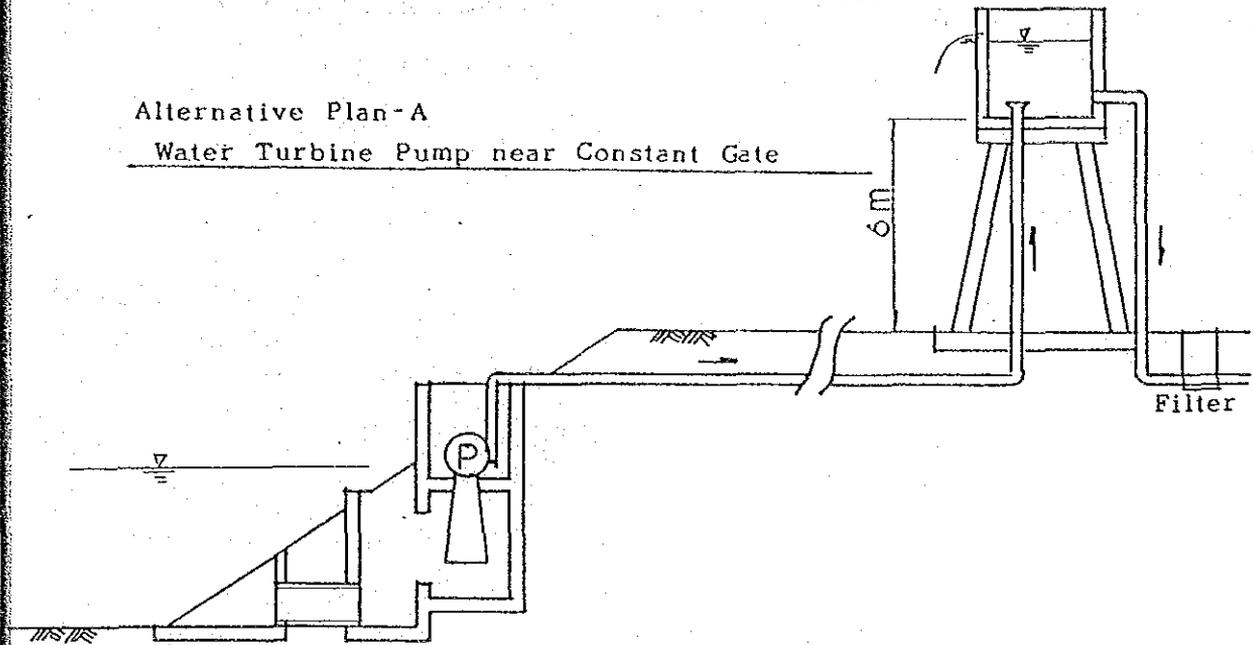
ALTERNATIVE PLAN OF PUMPING SYSTEM
